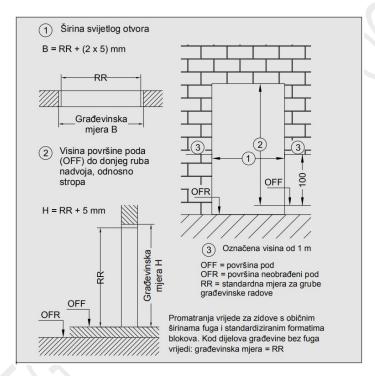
Instructions for checking the accuracy of the mounting hole dimensions
